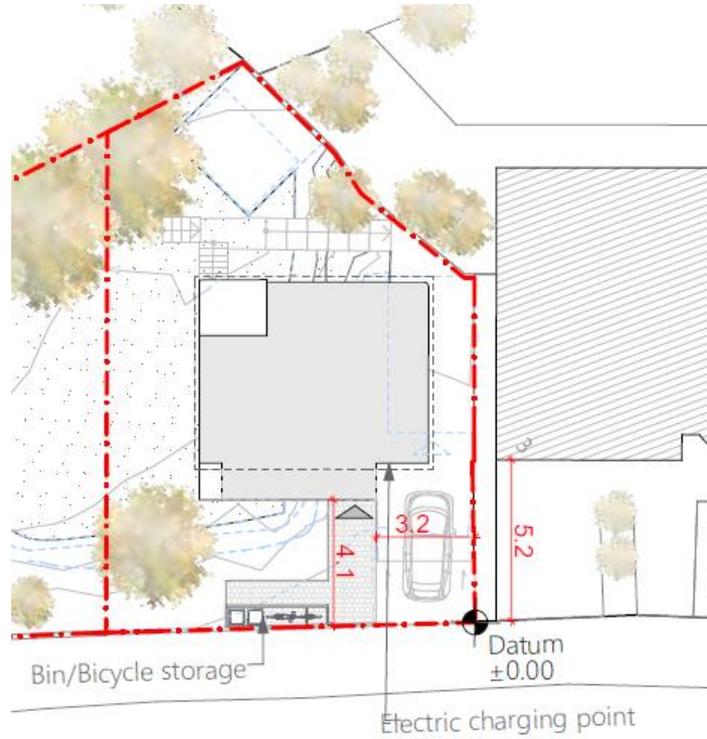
Balcony and raised steps as proposed on DC/20/118836
